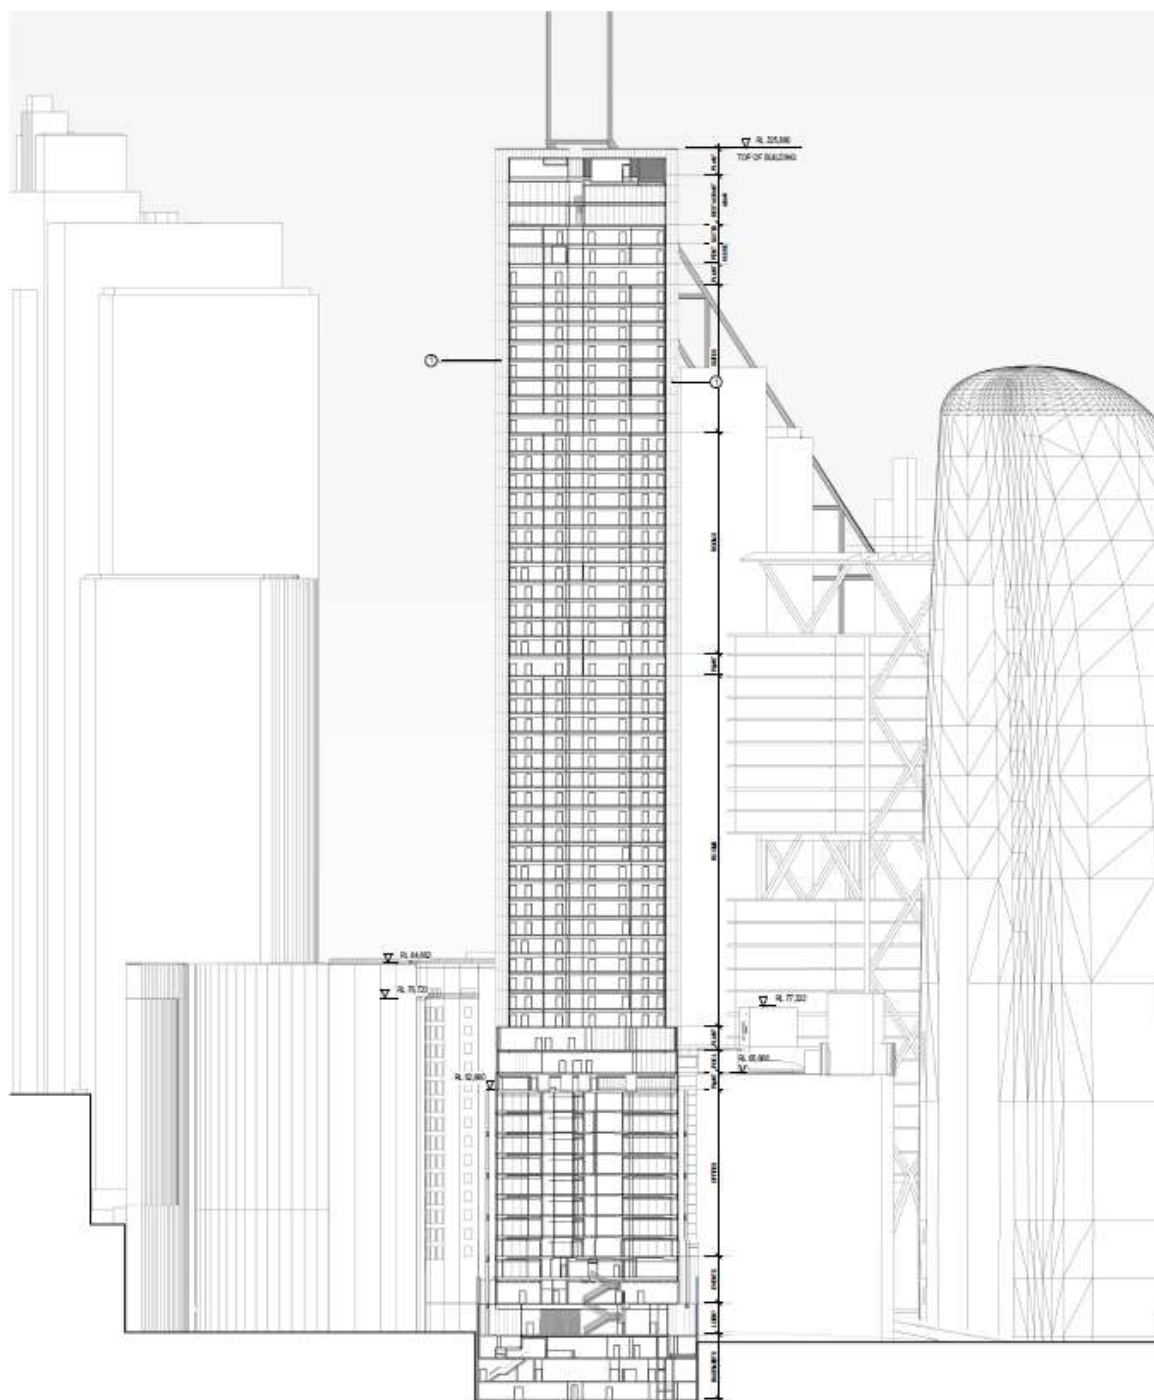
Section plan of the proposal (Woods Baggot 07/10/22)
